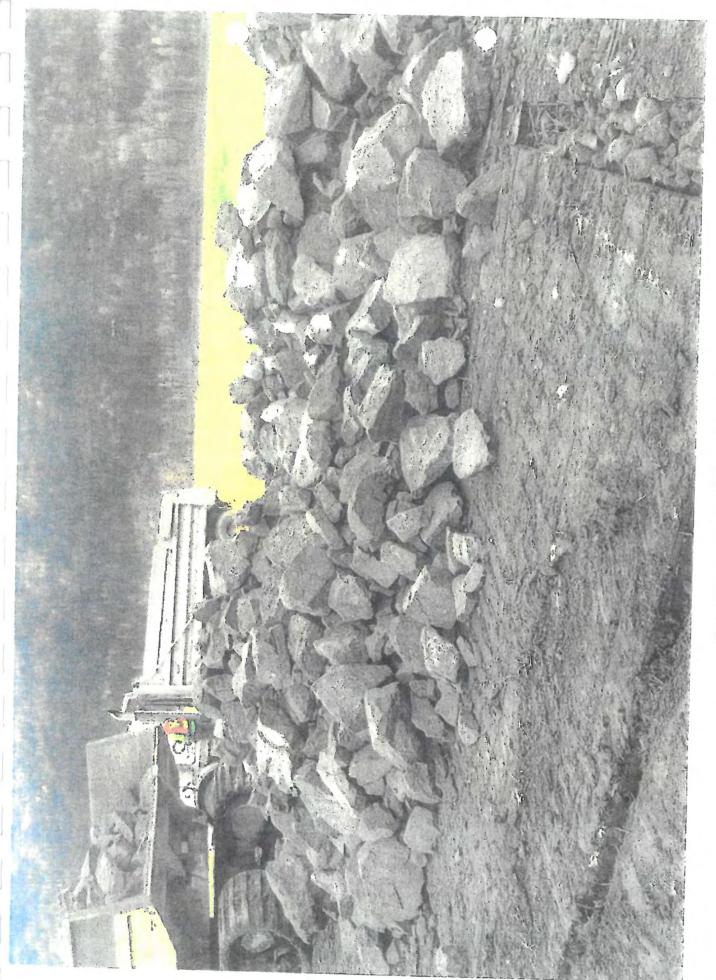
START OF RIP-RAP STOCKPILE AT TRUCK DUMP
